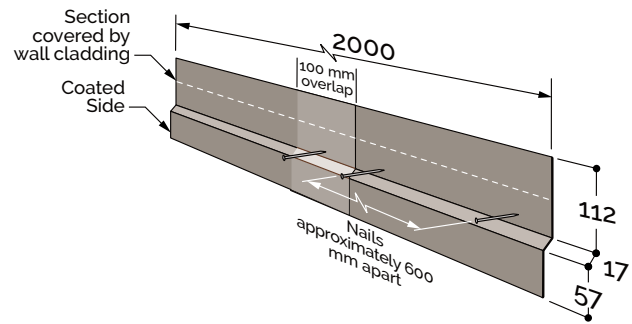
Positioning of side flashing lap for installation
